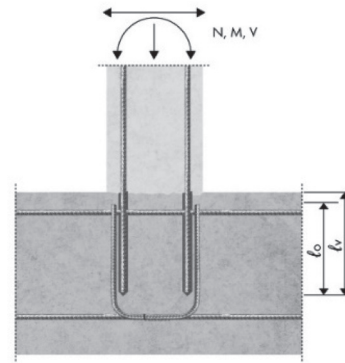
Overlap joint in a foundation of a column or wall where the rebars are stressed in tension
